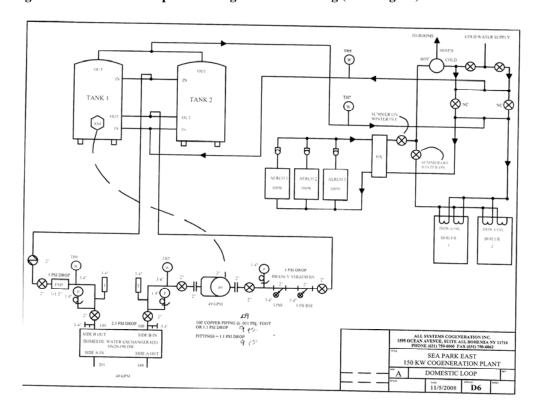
Connection of DHW HX into Building Systems (Drawing D6)
